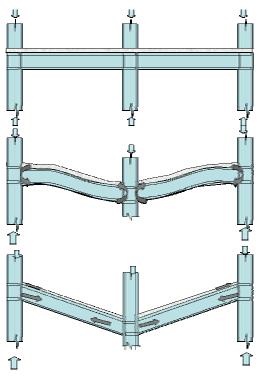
Load-resisting mechanisms upon removal of a supporting column
